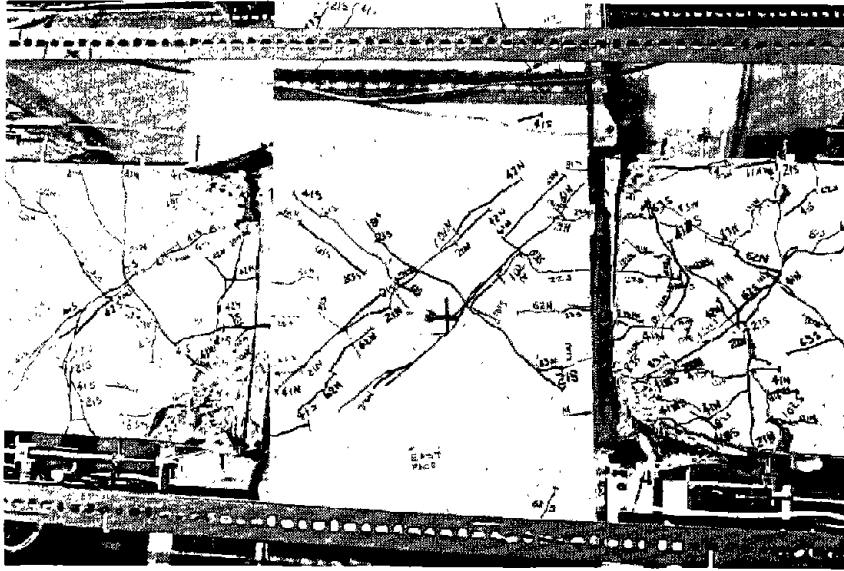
Specimen D-P-Z4 at failure - $12 \Delta_y$
